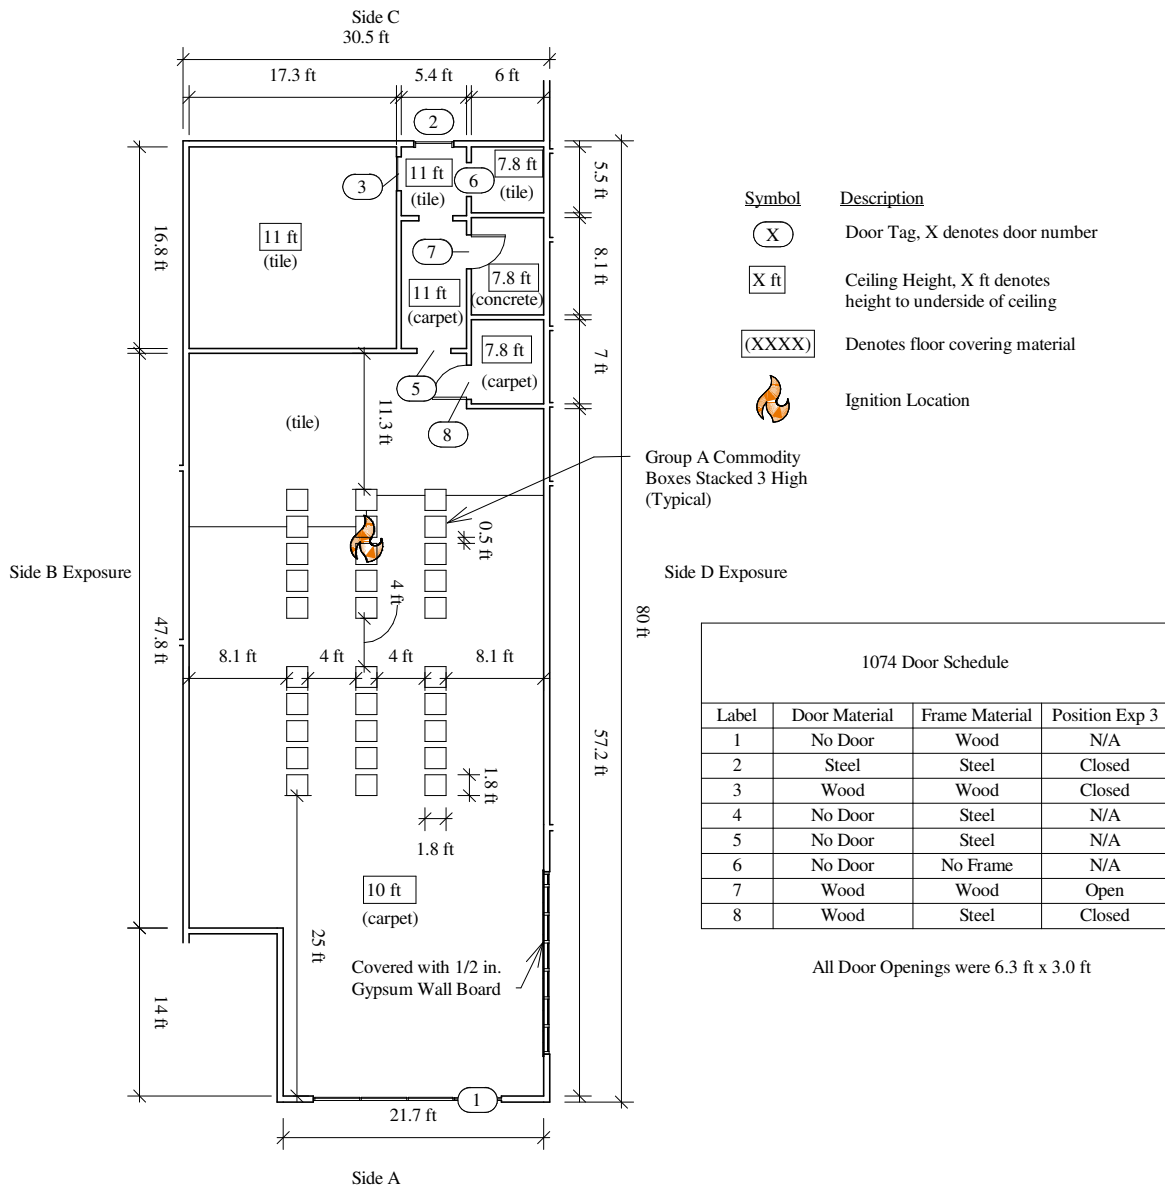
Floor plan of unit 1074 utilized for Experiment 3.
